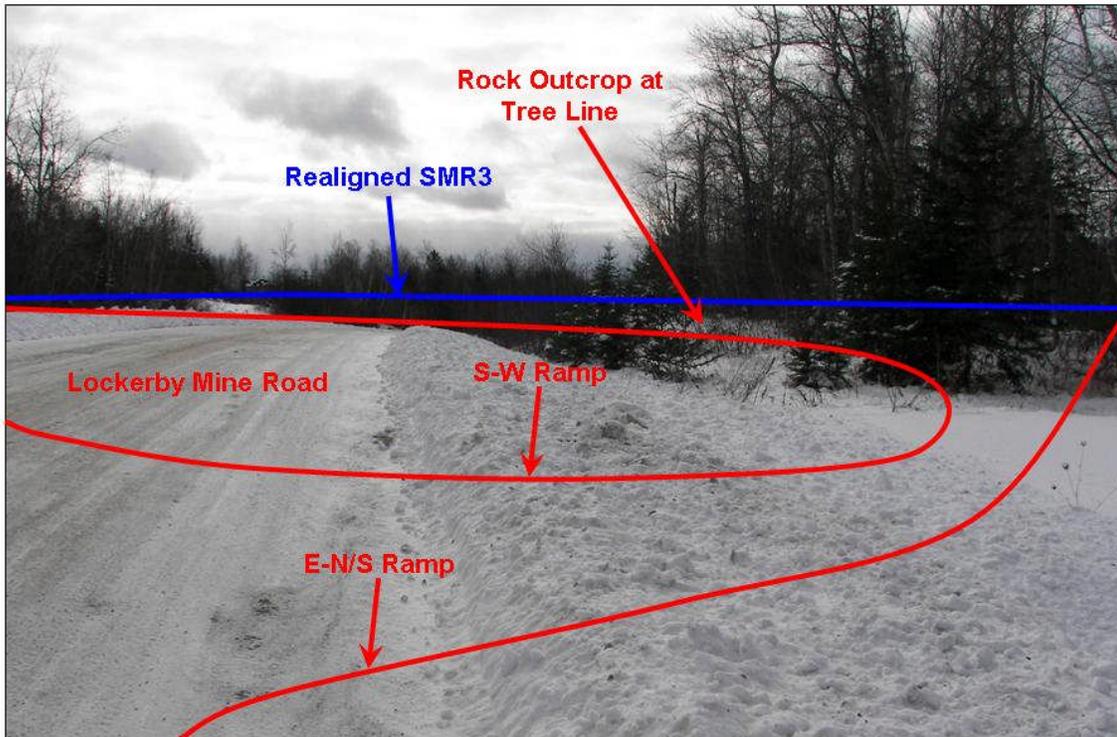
VIEW: Looking north from north shoulder of Lockerby Mine Road about 600 m east of intersection of existing SMR3. The Realigned SMR55 crosses the existing Lockerby Mine Road about 150 m to the west. The ground raises sharply to north. Shallow bedrock anticipated. Bedrock exposed in north ditch line at numerous locations to the west. (Dec. 6, 2007)
